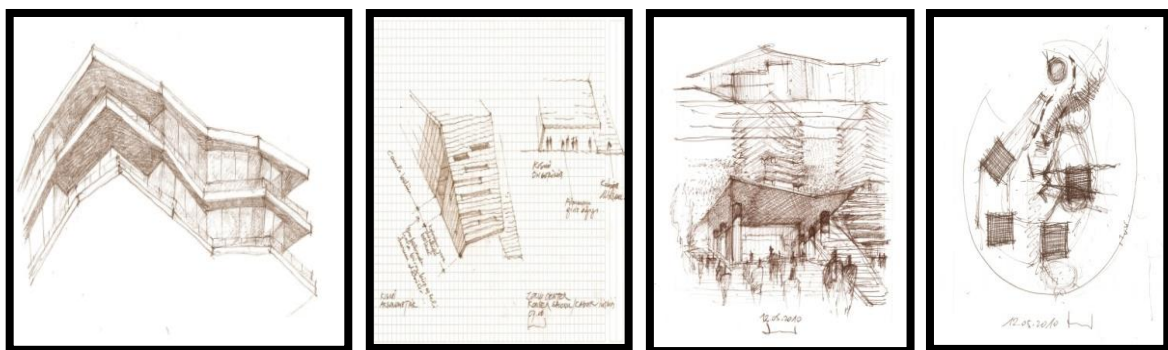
Emre Arolat's Zorlu Center Mixed-Used Complex's Sketches (Archdaily, 2014)
